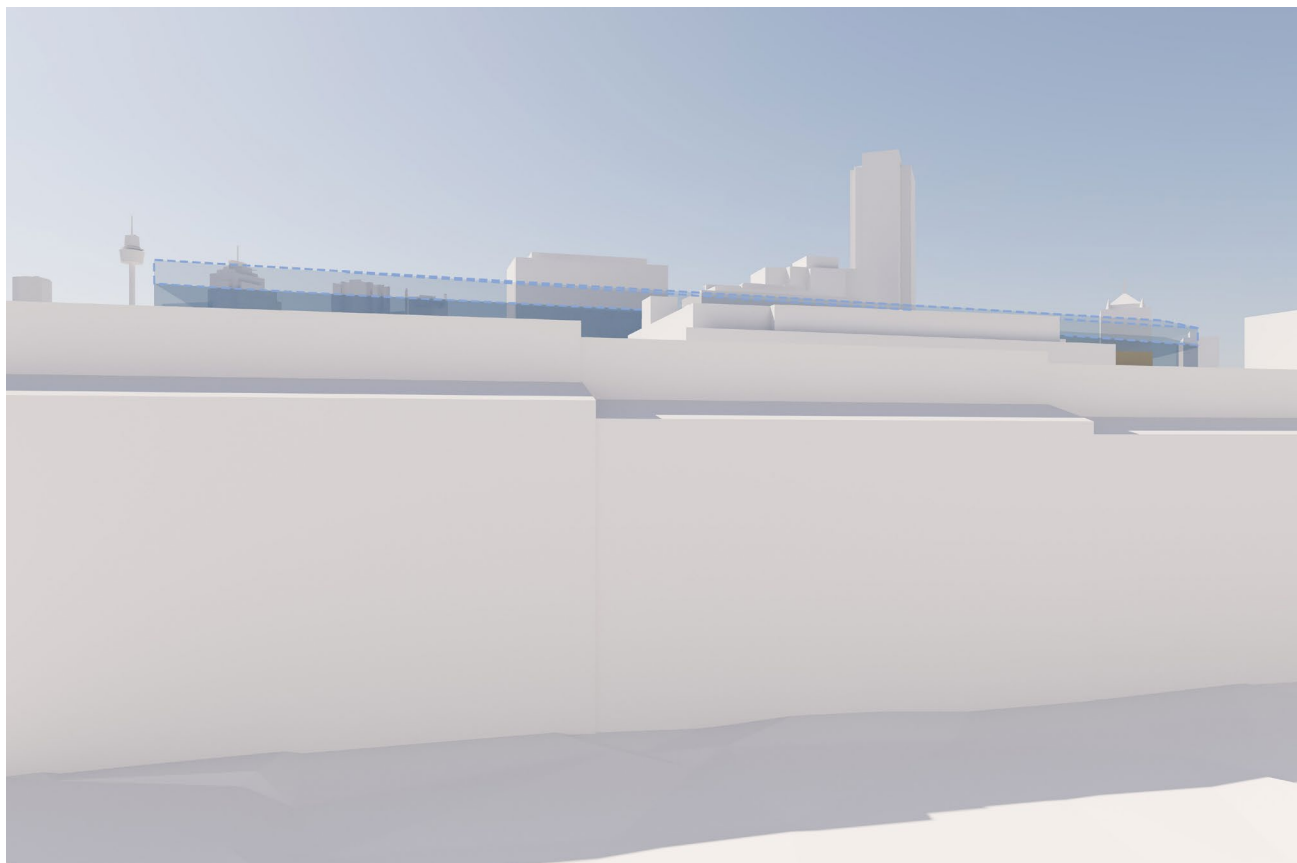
View 13: 333 Bulwara Street, Level 2 – existing view
